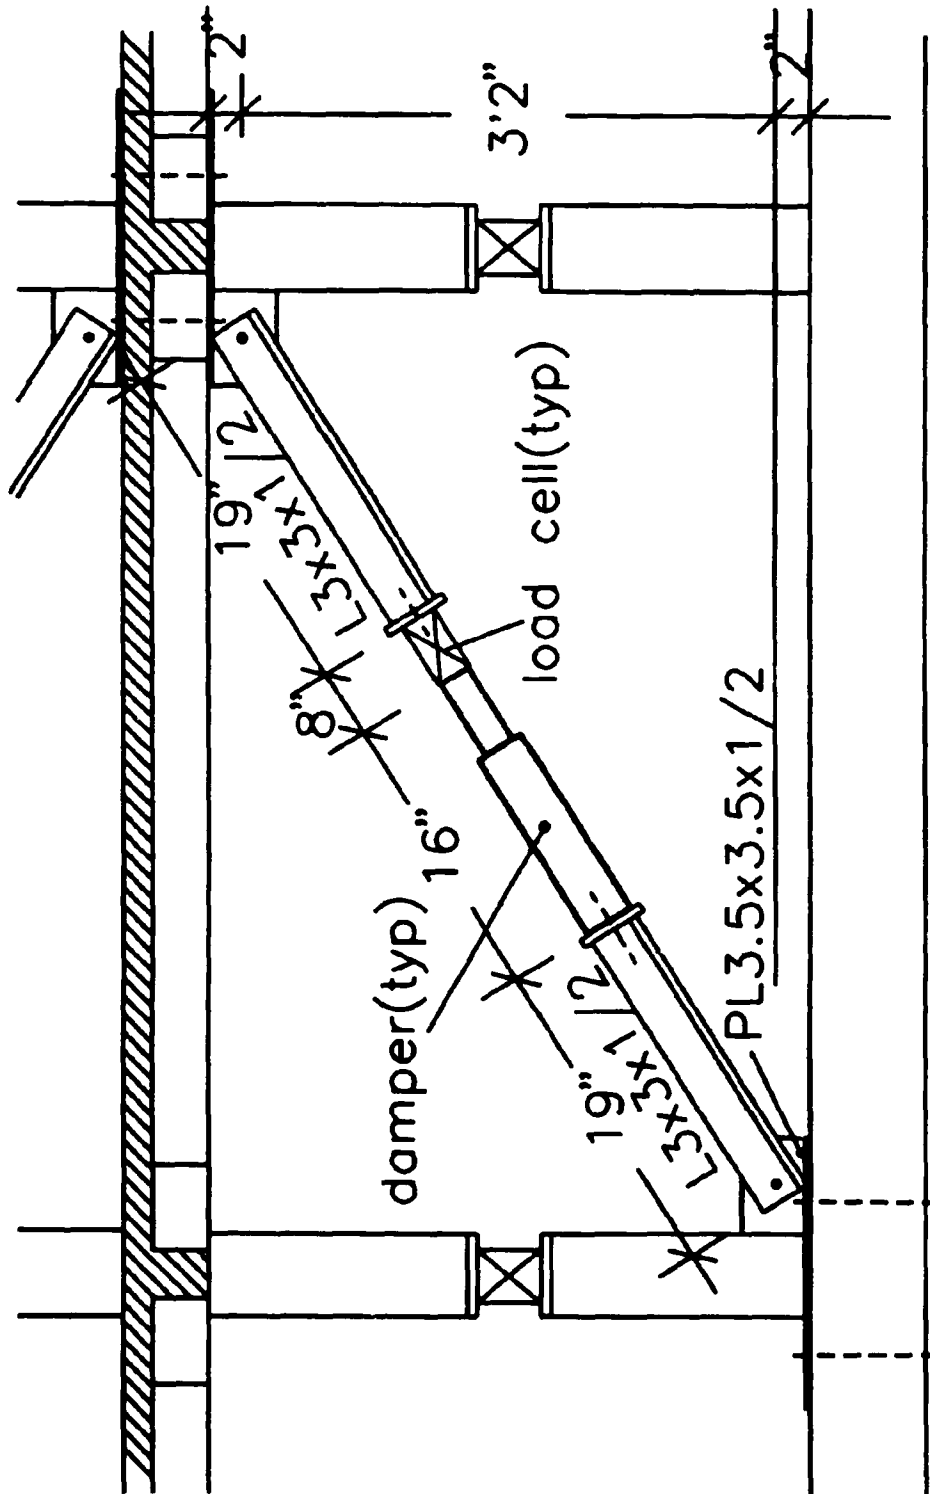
Installation Detail of a Damper in the Mid-bay of the Frame
